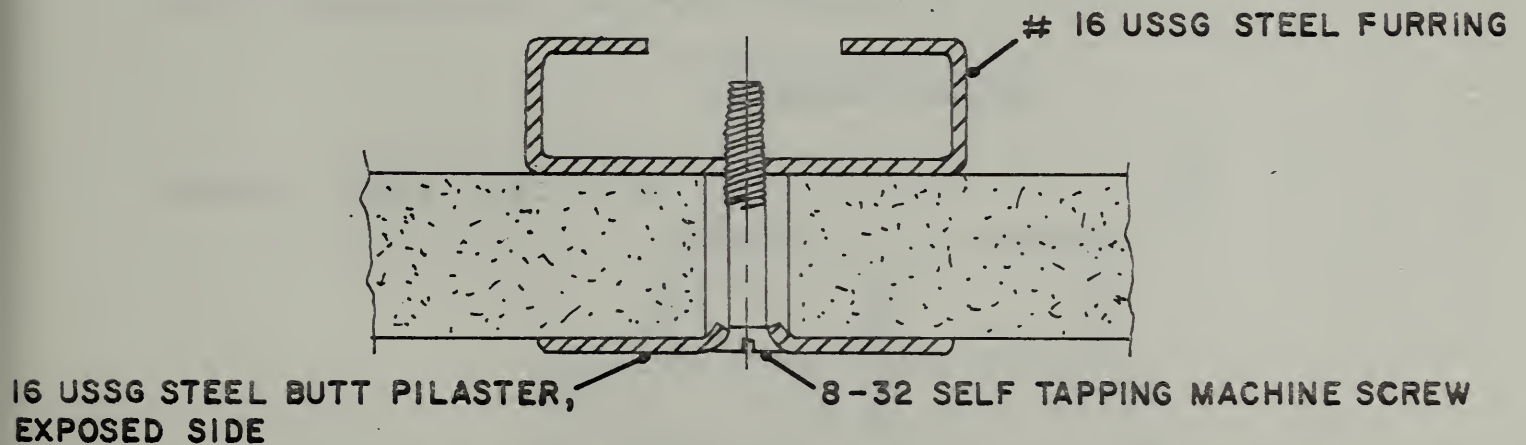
JOINER DETAILS FOR SINGLE FACED CONSTRUCTIONS
